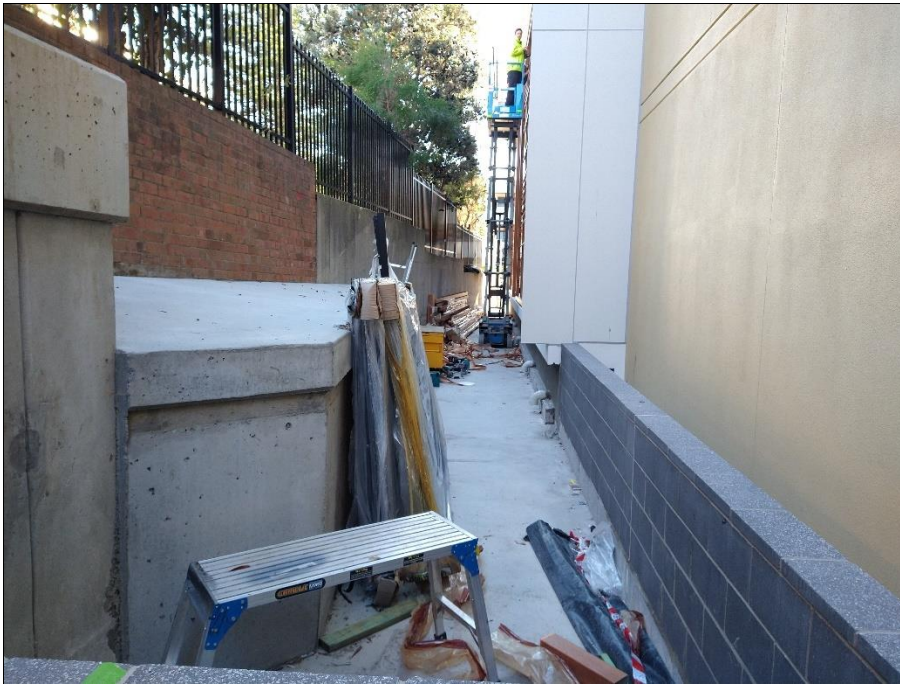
Concrete (capping) to the western side of Education Building (13 July 2021)
